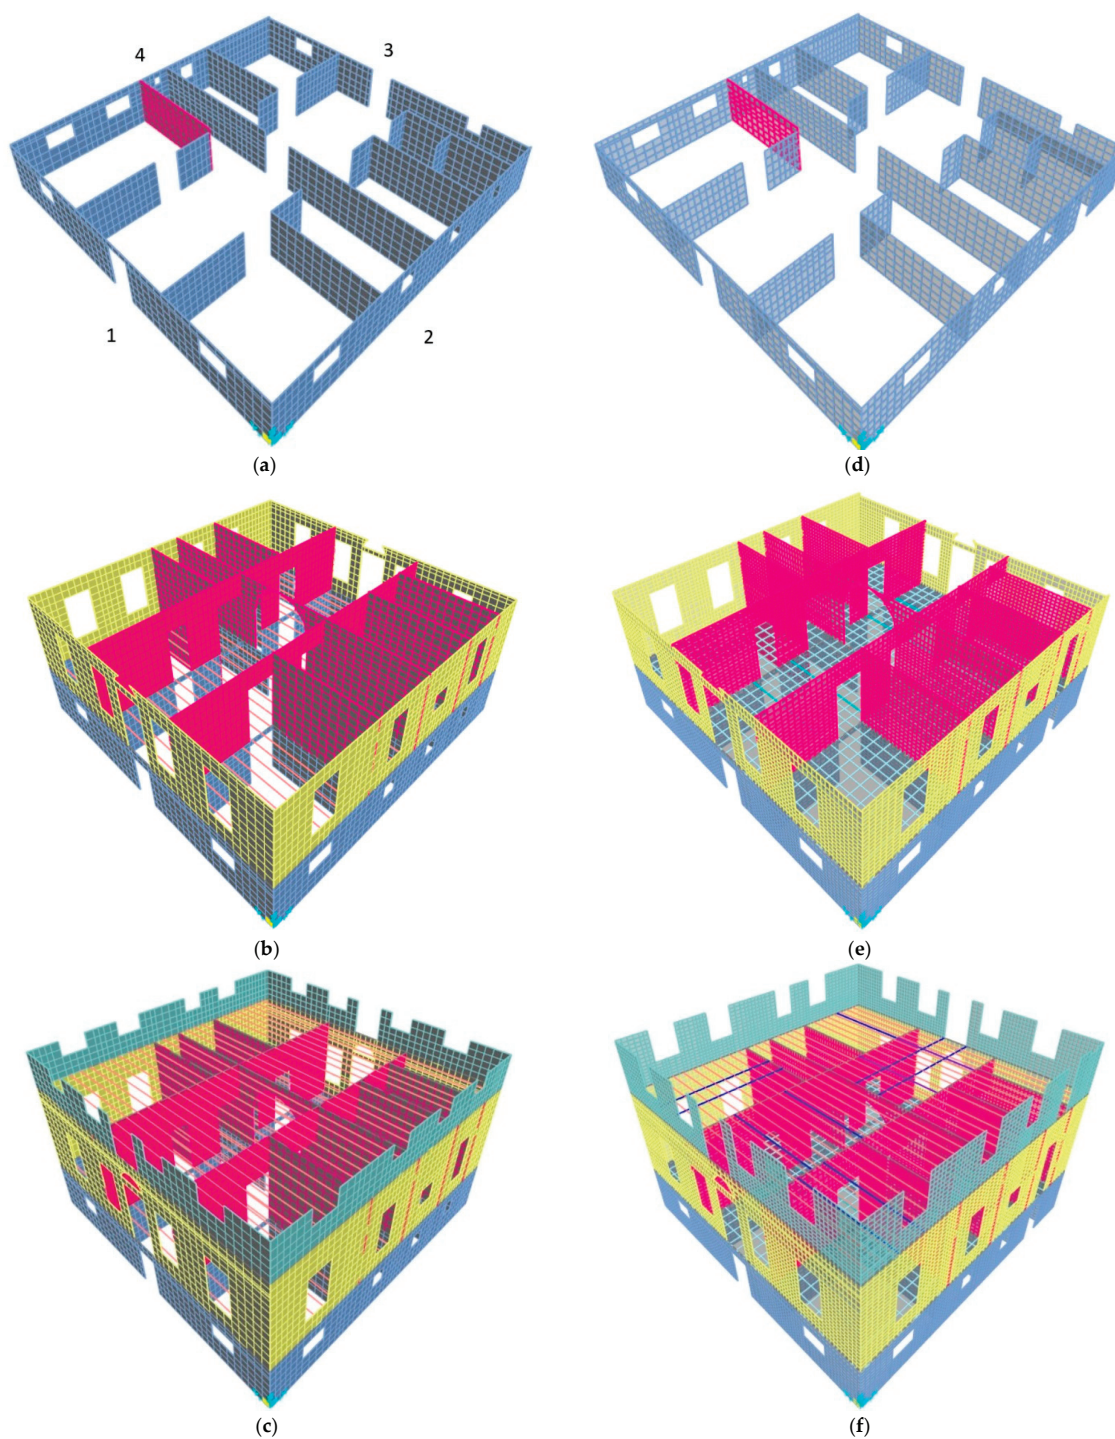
FE Models 1 and 2: M1: Ground floor with numbered building elevations (a), first floor (b) and second floor (c); M2: Ground floor (d), first floor (e) and second floor (f).
